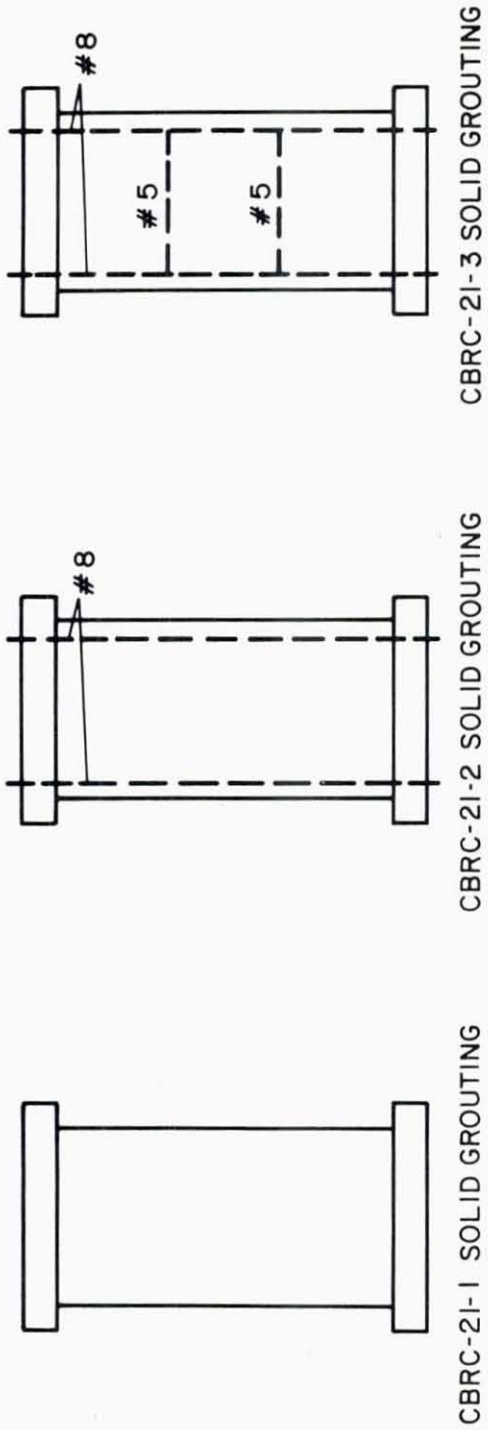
(b) REINFORCING STEEL ARRANGEMENTS FOR GROUTED CORE BRICK PIERS (CBRC)
